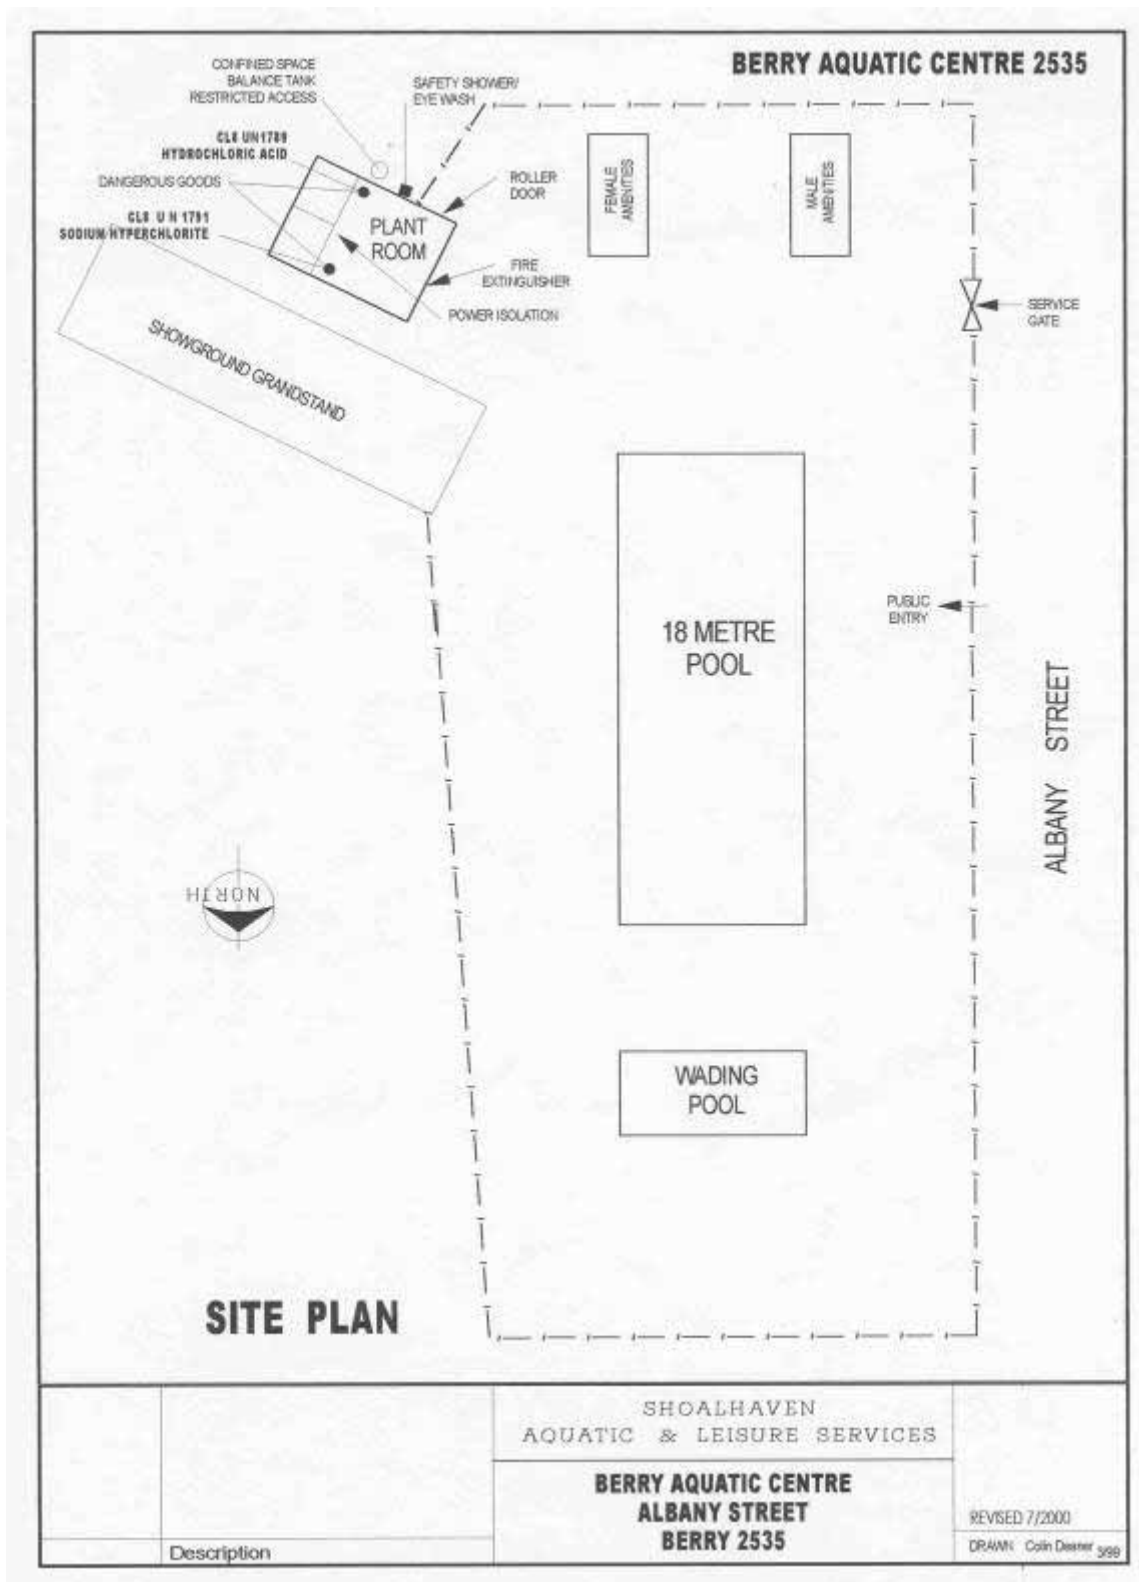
Layout of facilities at the Berry Village Swimming Pool.
